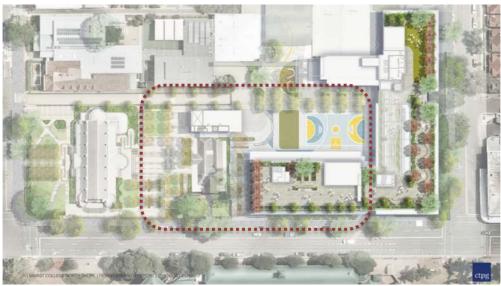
Proposed site plan. Proposed landscape piazza and open space outlined. WMK Architects, August 021.
